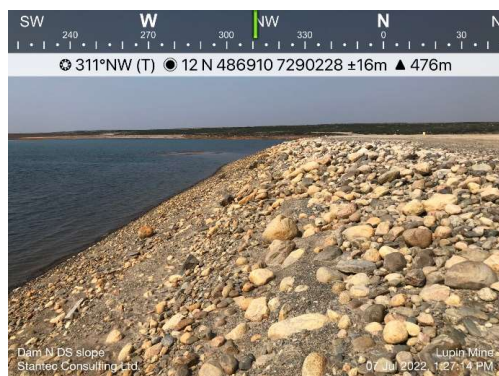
Looking northwest at the downstream slope of Dam N with Pond 2.
